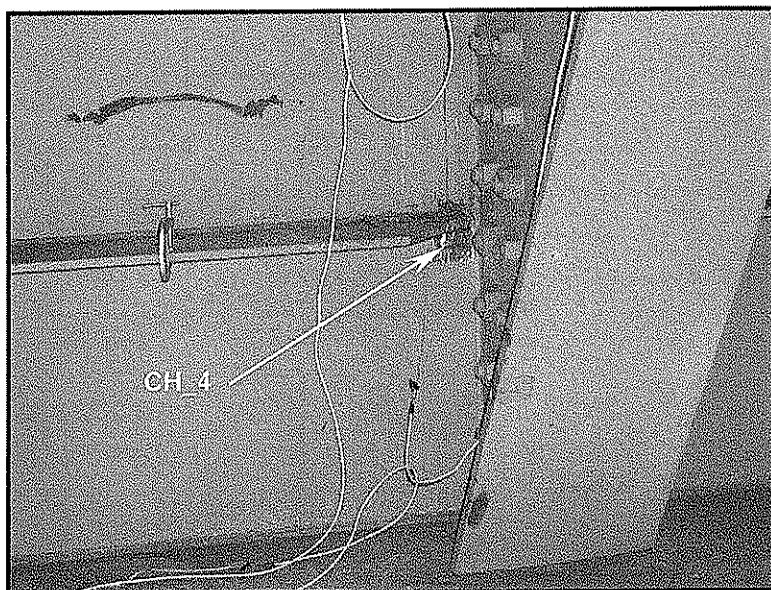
Photograph of strain gage CH_4 installed at the web gap of a longitudinal stiffener at floorbeam FB35 at girder G1
